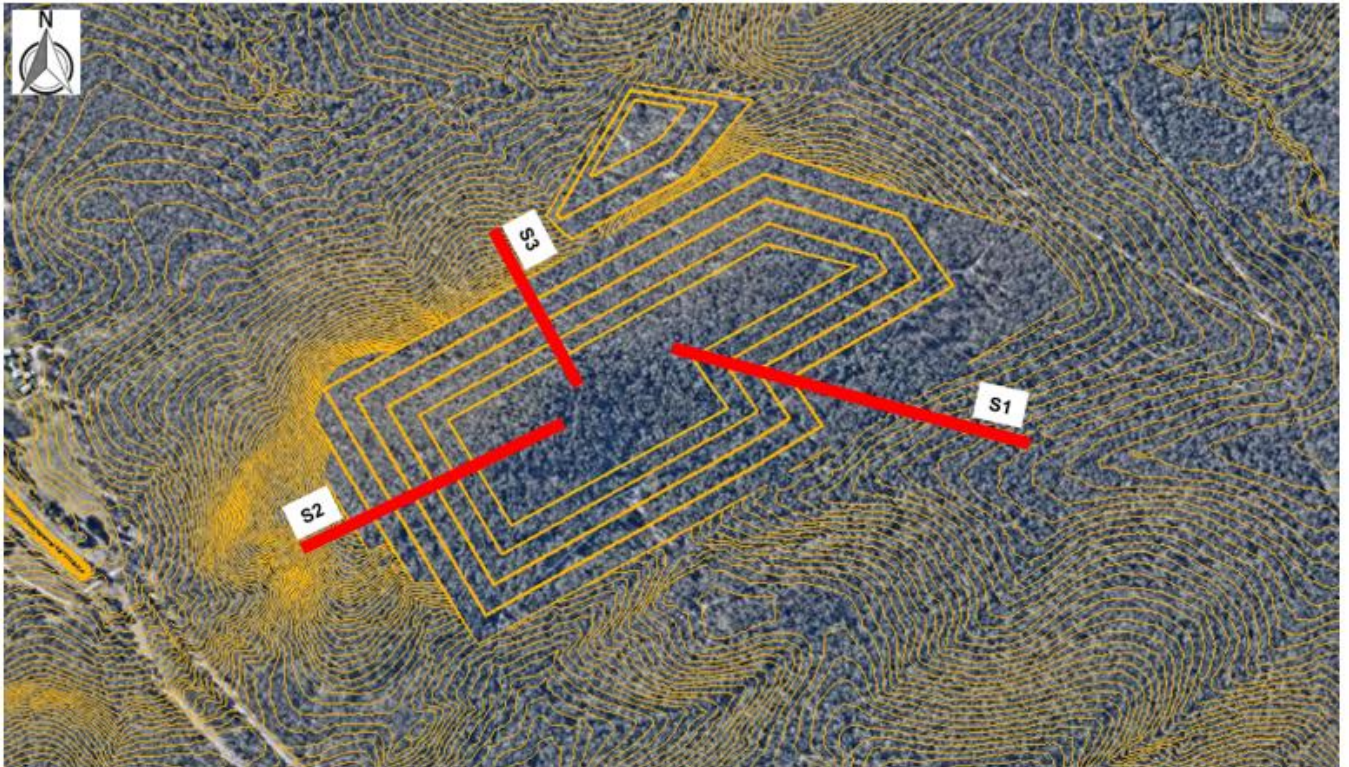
Plan View of Proposed Stone Ridge Pit Depicting Nominated Stability Sections
